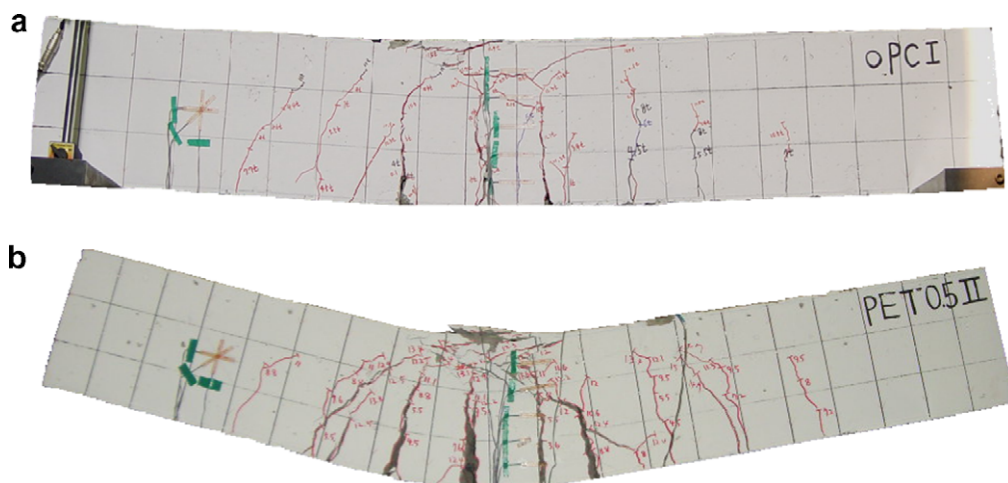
Failure modes of RC beams; (a) NF RC beam; (b) RPET fiber reinforced RC beam.
